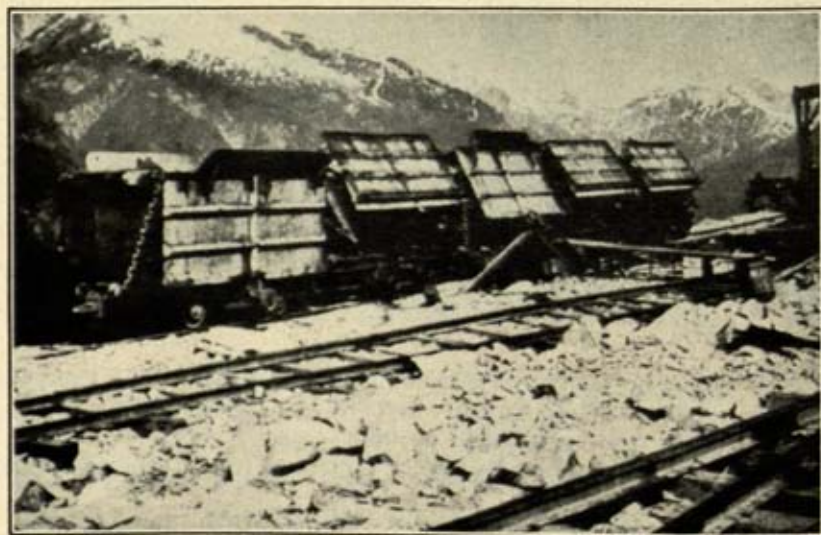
Automatic side-dump muck cars. (*Construction Methods and Equipment.*)
